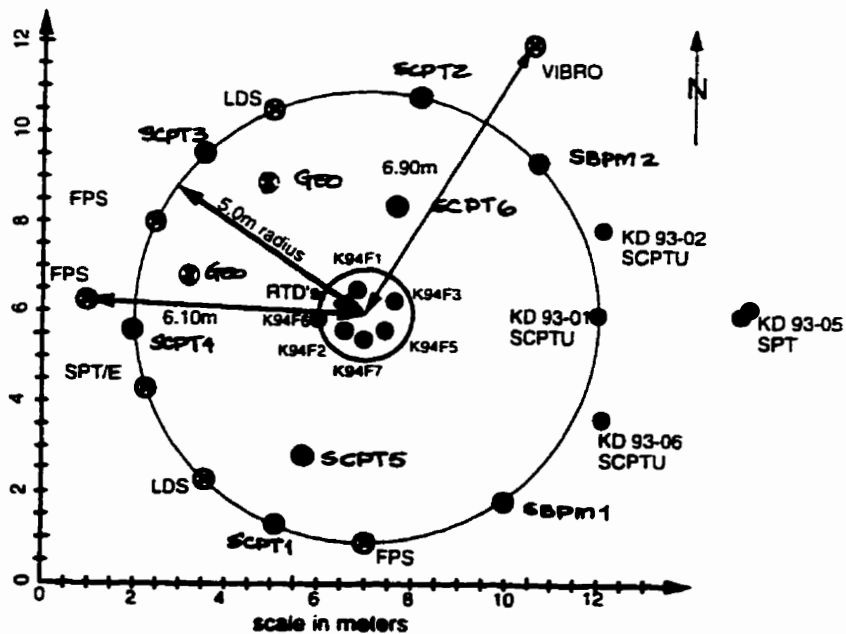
Detailed Characterization Zone at the Massey Tunnel Site.
